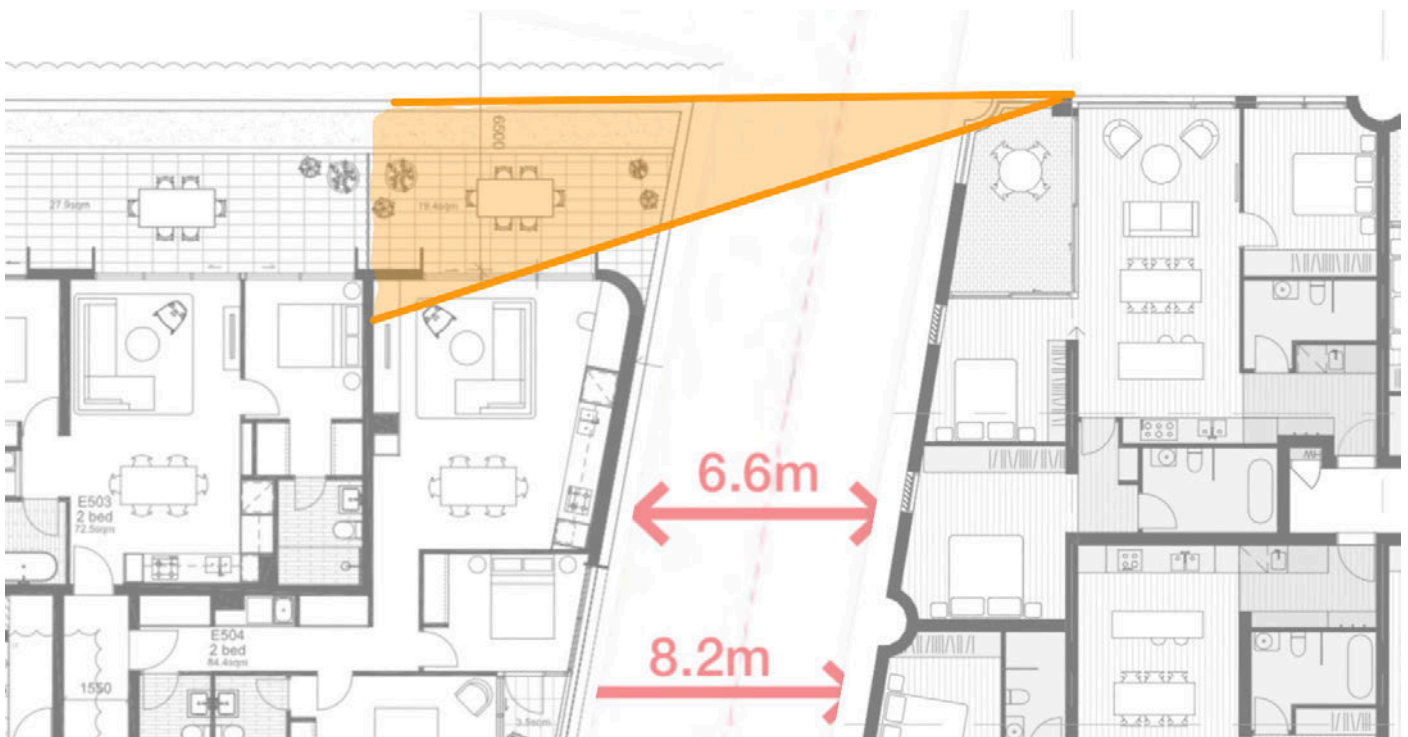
Overlooking concern from increased street wall condition to 7 Metters Street property. Please note the plan for 7MS has been updated to reflect the as built condition rather than initial DA scheme. Please note this highlights living space on north facing terrace.
